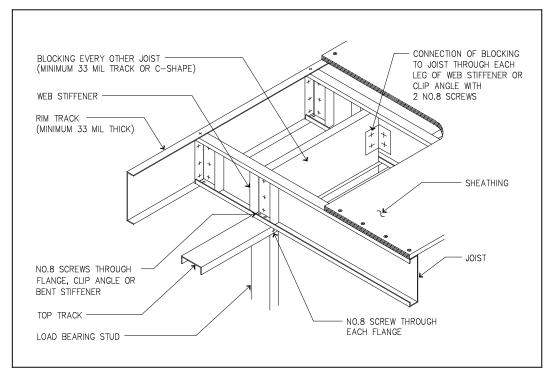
Cantilevered Floor to Exterior Structural Wall Connection
